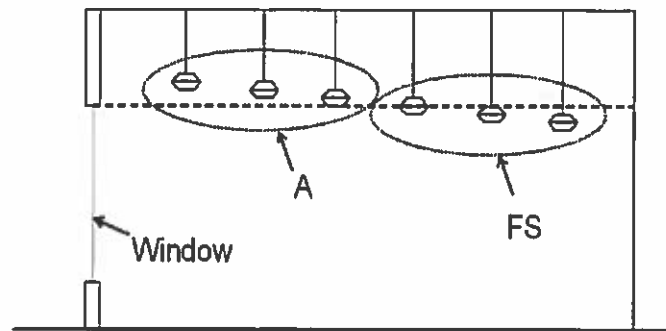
Figure A: Elevation view showing a non-residential application of indoor lighting, labeled FS, which will be subject to this ordinance and indoor lighting, labeled A, which is installed so that it is not subject to this Ordinance.
